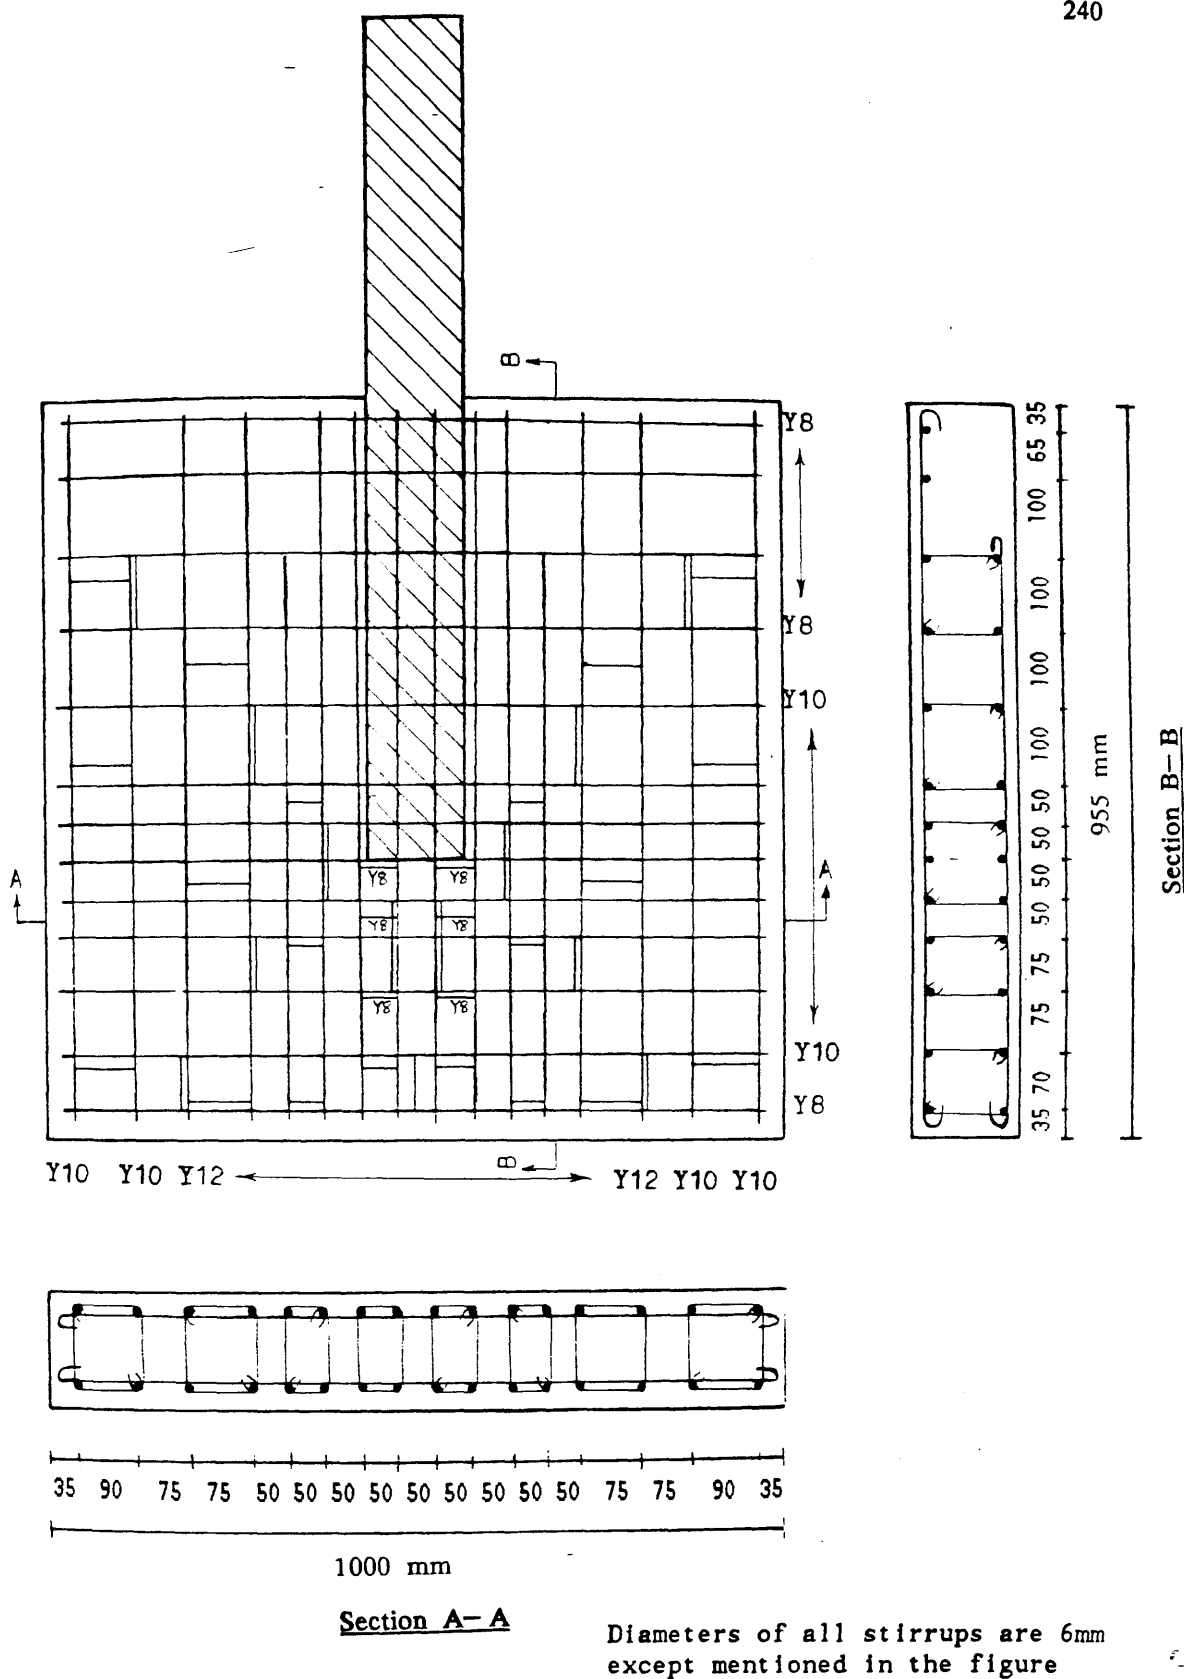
a) : Arrangement of top reinforcing bars including closed vertical stirrup in the slab of model MS6
